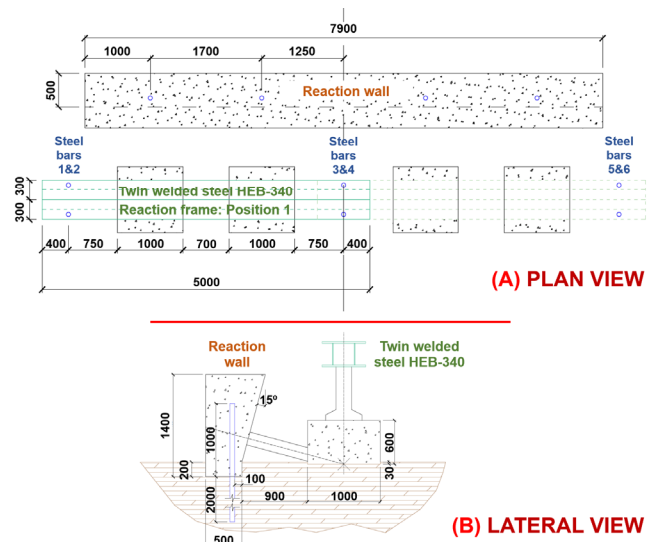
Design drawings of the reaction frame and the concrete wall: (A) Plan view, (B) Lateral View.
